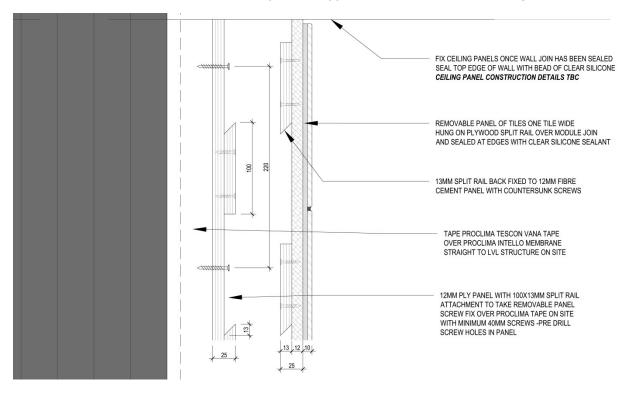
Sectional construction detail for removable tile panel and split rail
